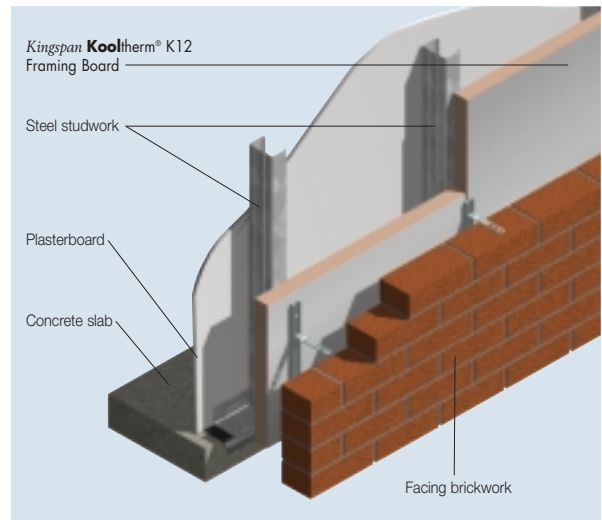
Brick Faced Steel Frame Wall (Insulation Between Studs)
